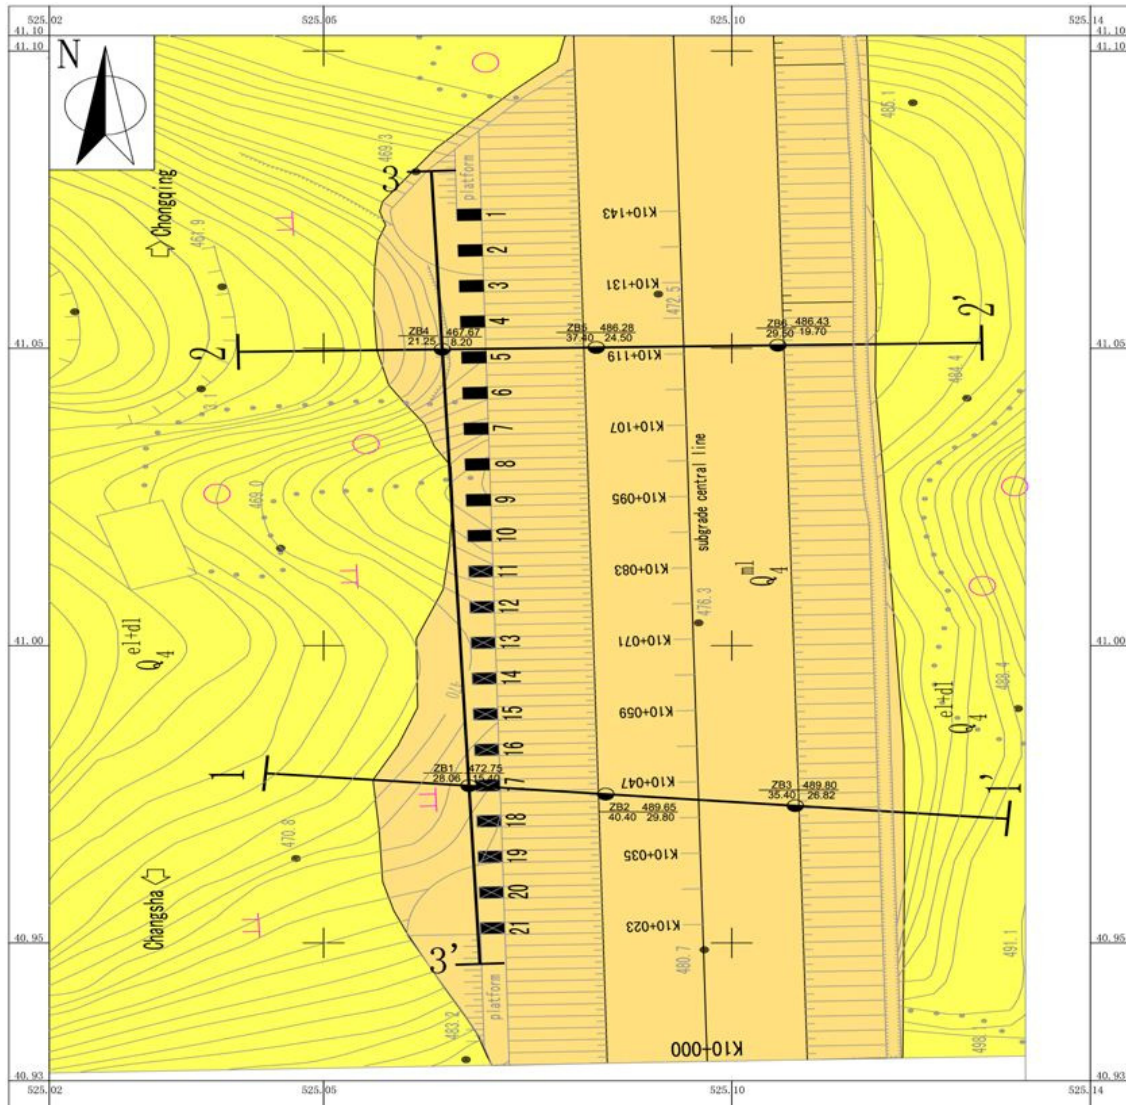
The layout plan of sheet-pile wall and high-filled subgrade of K10+022 ~ K10+144
